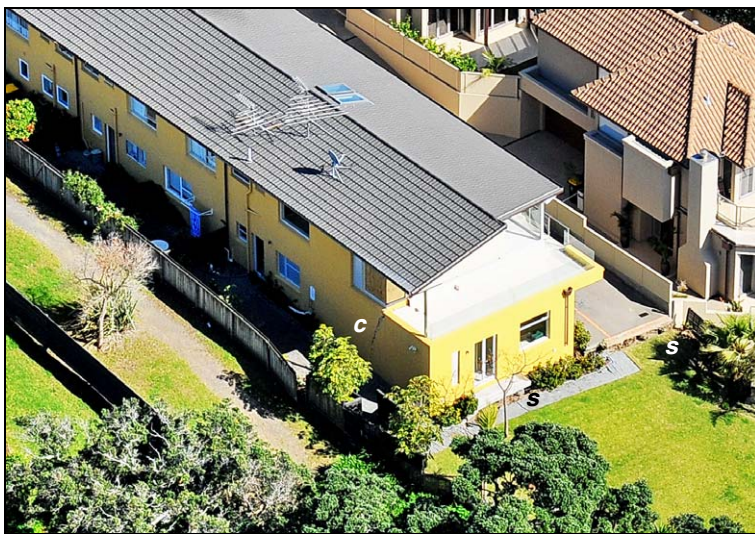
The yellow house at 116 Covelly Road was most damaged by the slow ground movements, which caused significant cracking (c) and structural damage to the front part of the house, and up to 1 m subsidence (s) of the lawn. [GNS Photo: GTH-0617]
